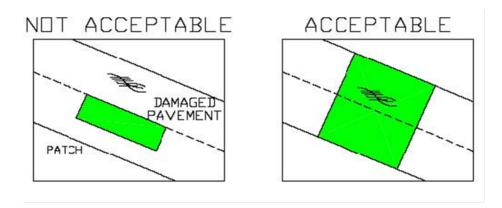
Example 12: Damaged pavement within 10 feet of a patch must also be patched.
